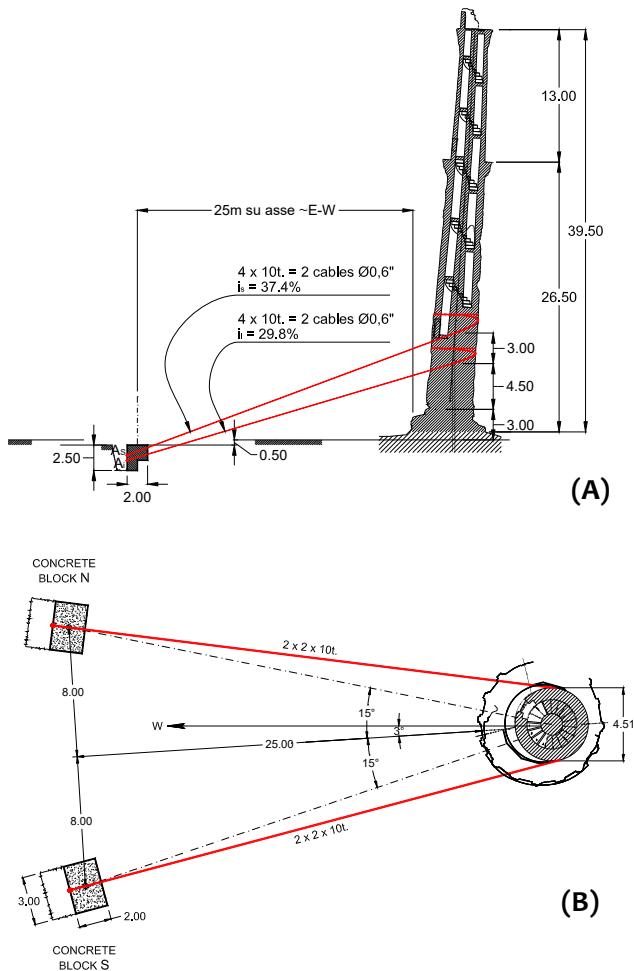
Temporary stabilization of the Minaret of Herat, Afghanistan by means of steel cables, anchored to the floor in RC anchor block (Courtesy: Prof. Giorgio Macchi, University of Pavia, Italy).
